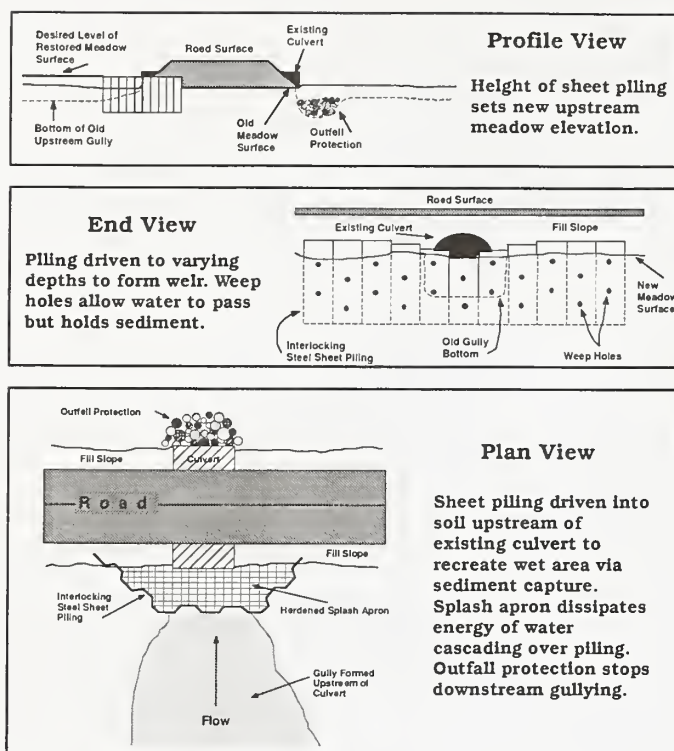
Using interlocking steel sheet piling upstream of an existing culvert to recreate wet area.
